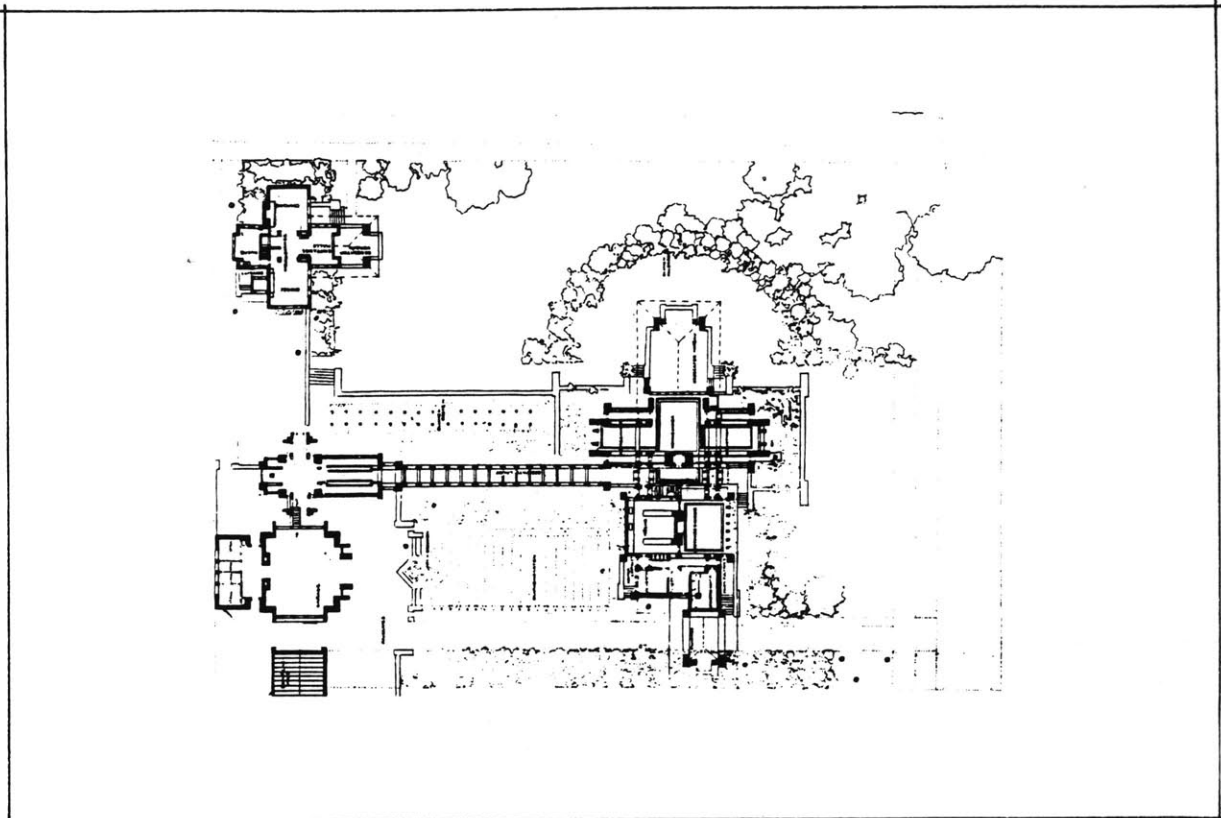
Plan of Martin House, Buffalo. Frank Lloyd Wright. 1904
